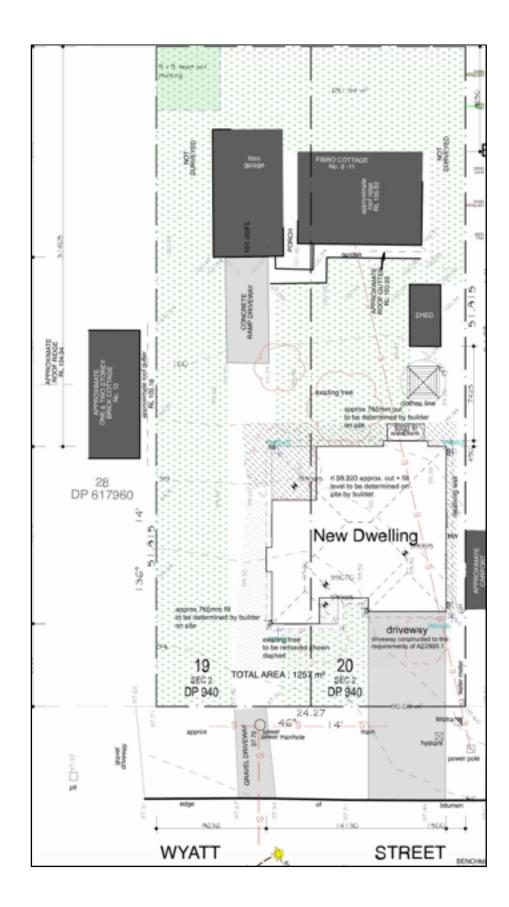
Site plan of DA18/0243 showing the new dwelling and the existing dwelling
